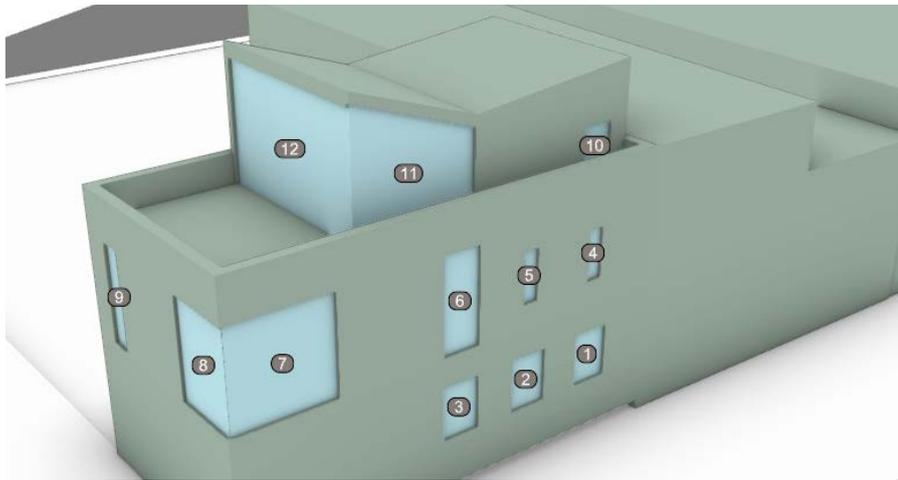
No.12 Sussex Street - View of model locating VSC test points
